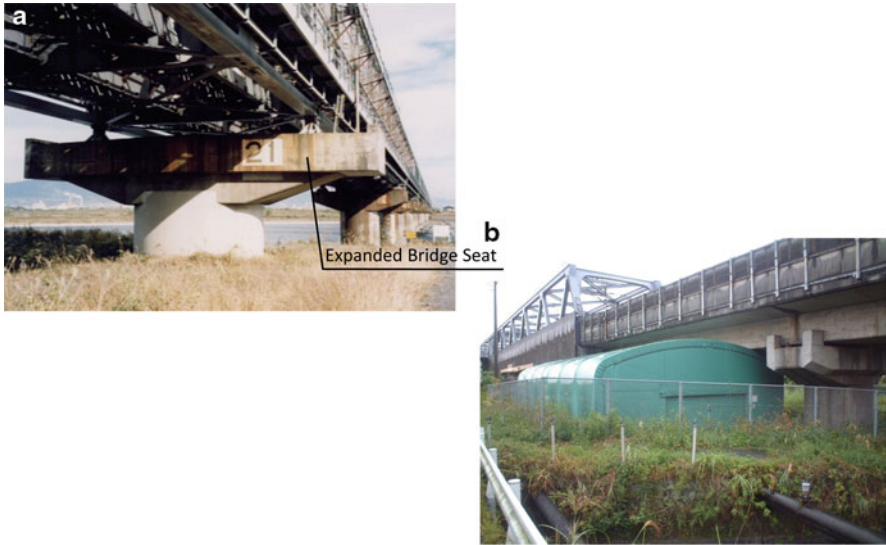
Measures for Tokaido shinkansen against surface earthquake fault. (a) Expansion of bridge seat for prevention of girders' falling. (b) Storage of preparatory members of the truss bridge
